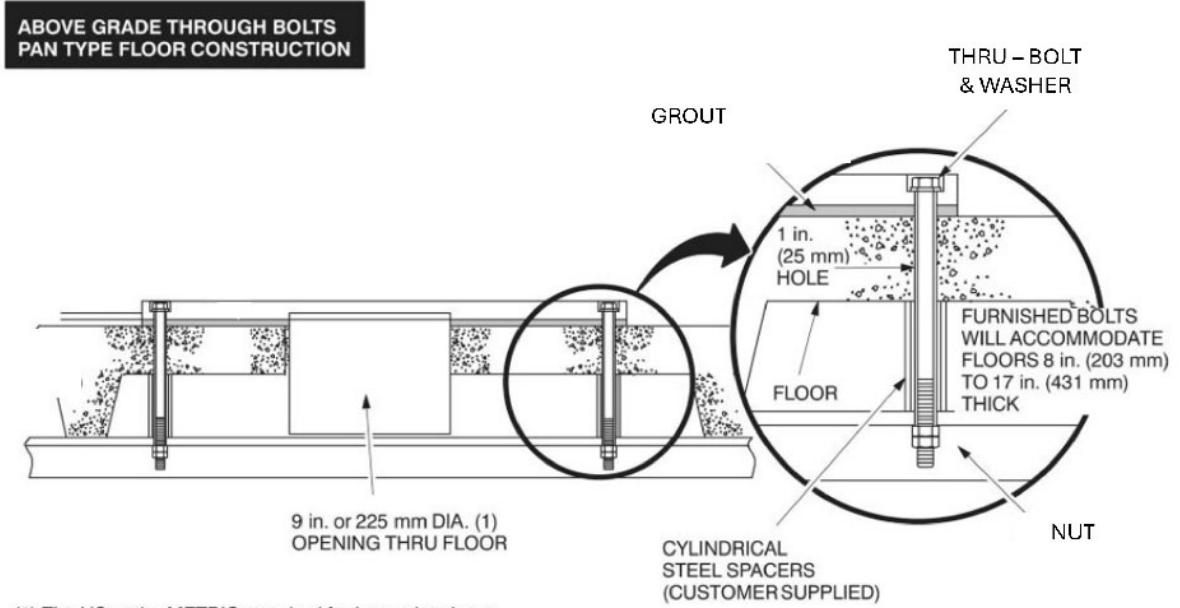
Inner Base Plate (Water Electric Separator) for Above Grade Floor Anchor Kit
